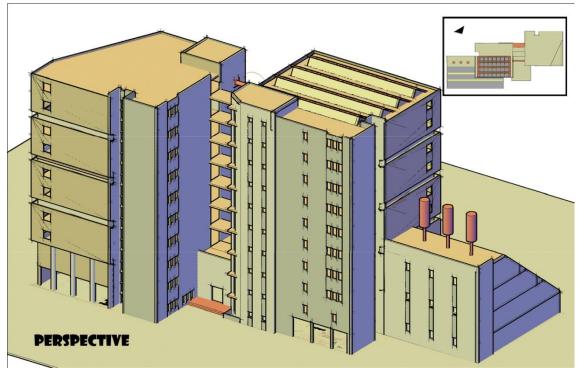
Perspective sketch showing the west north elevation of proposed model of vertical farm building in phase 2
